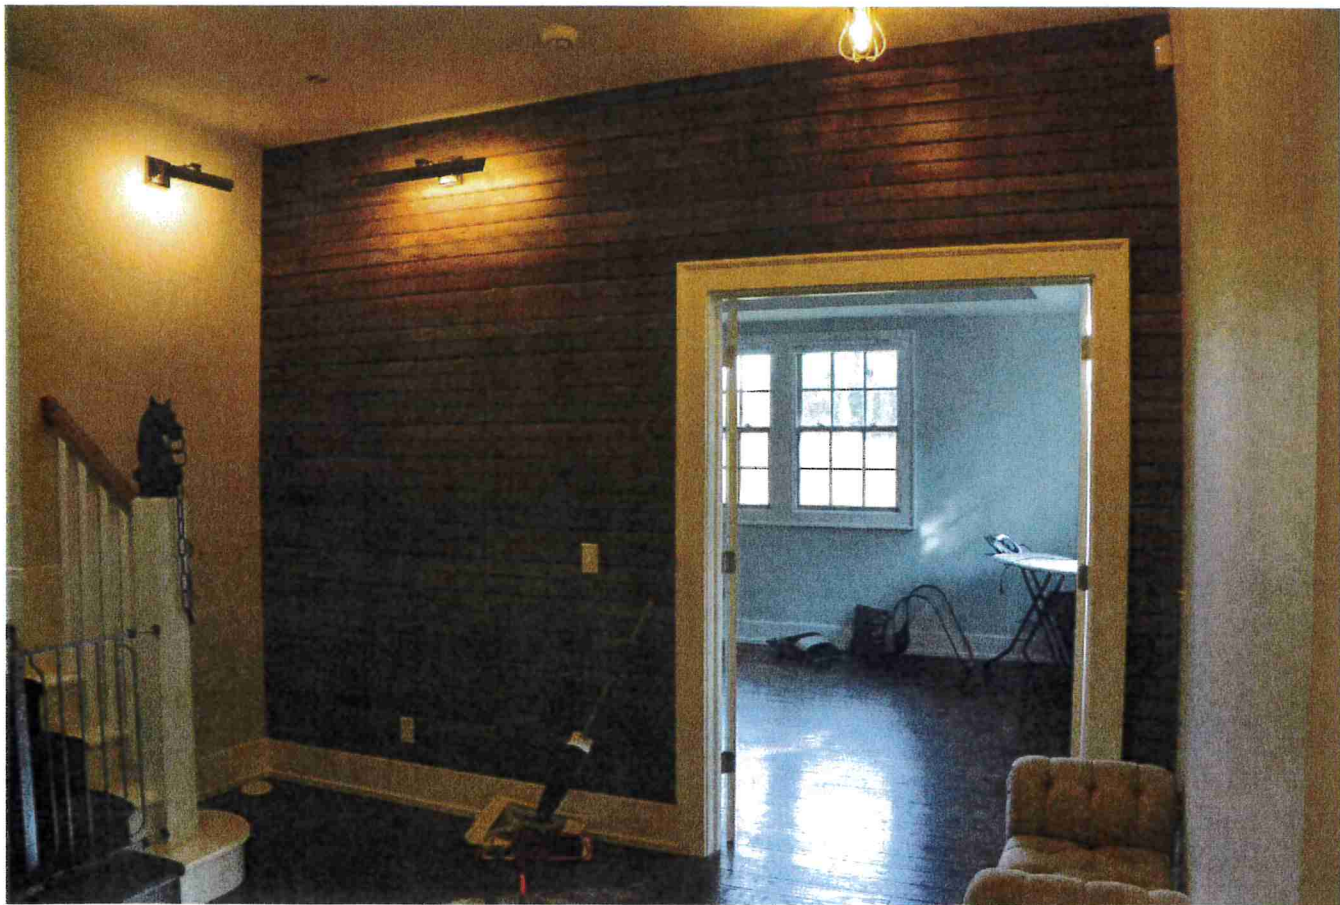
Salvaged tongue and groove boards reinstalled on interior wall. 10/28/16
